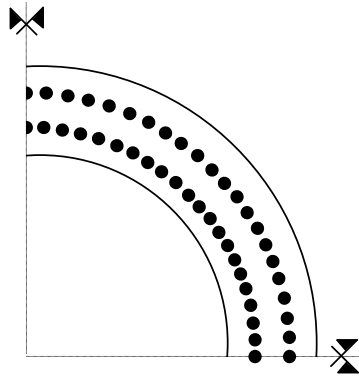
1/4 of the interface cross-section, concrete and steel bolts for a circular foundation
